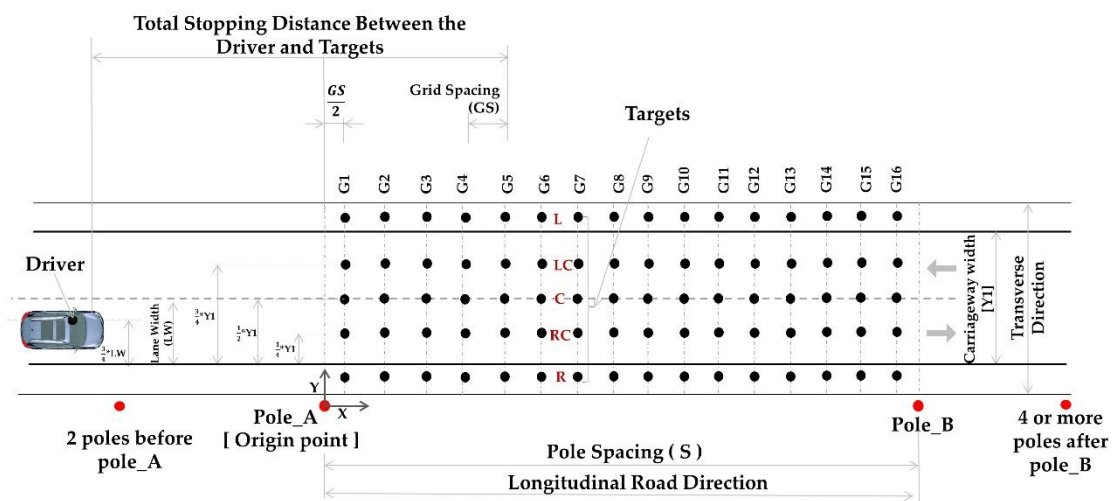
Plan view of the new arrangement of design element in the roadway lighting environment.
